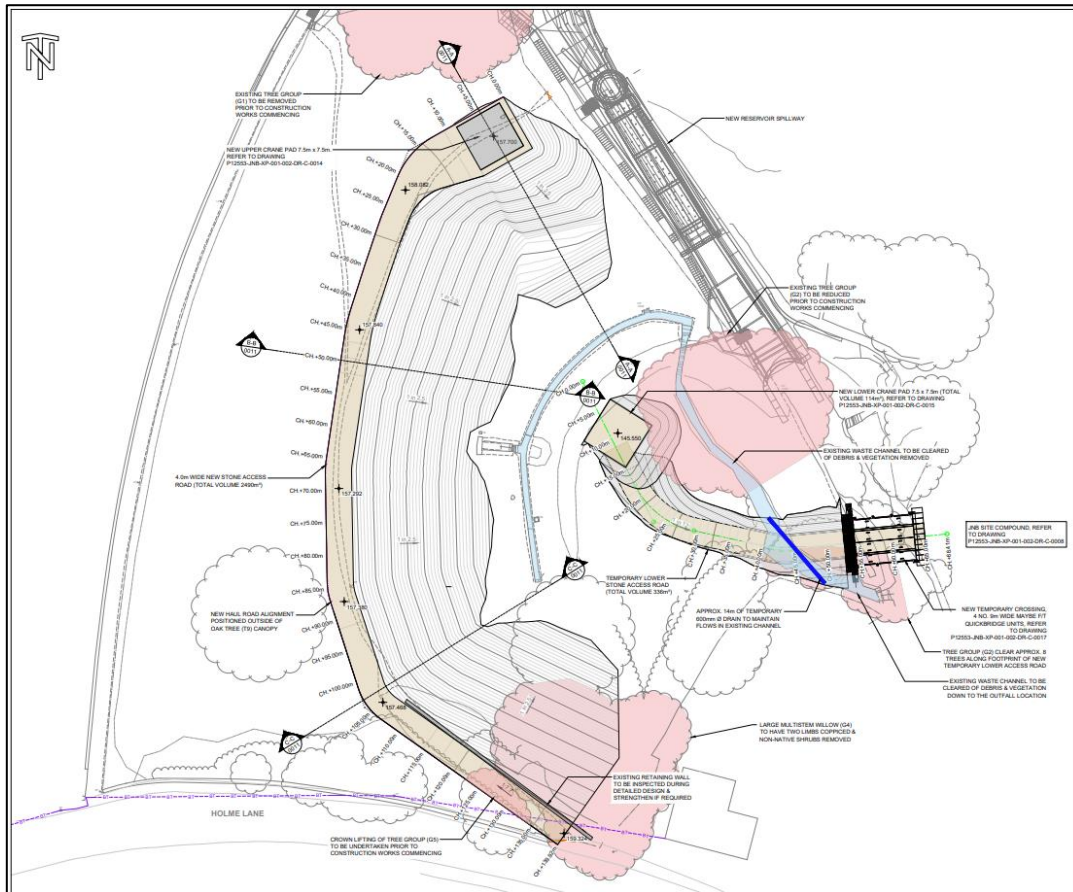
Access Road 1a/b, 2 and crane pad general arrangement
